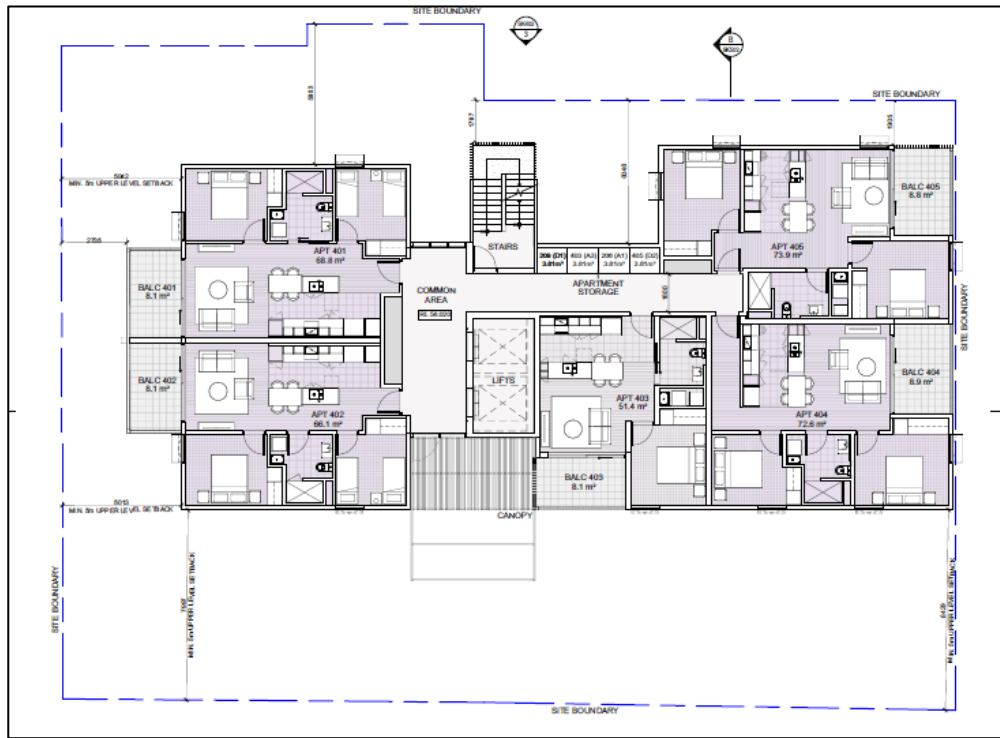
General Floor plan for Levels 4 and 5 (Level 4 shown).
